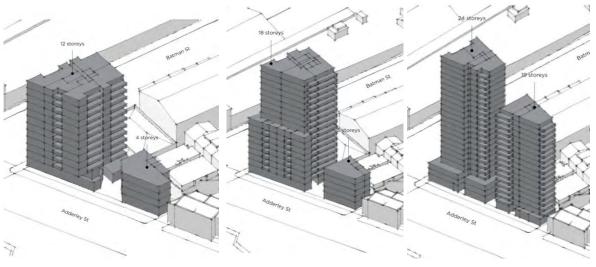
Built form testing, 60-80 Adderley Street at 6:1, 9:1 and 10:1Source: Mr McLeod's expert witness statement
